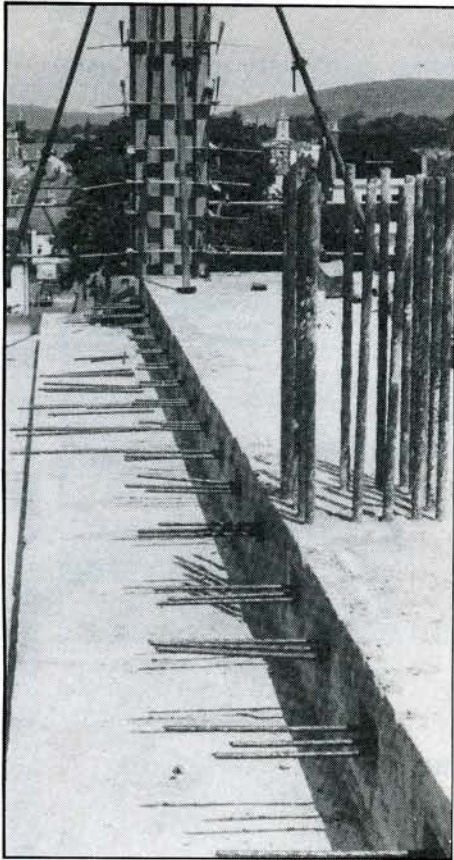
Flat slab flooring using lightweight concrete and unbonded tendons. Project in Cheltenham designed by Clarke, Nicholls and Marcel
